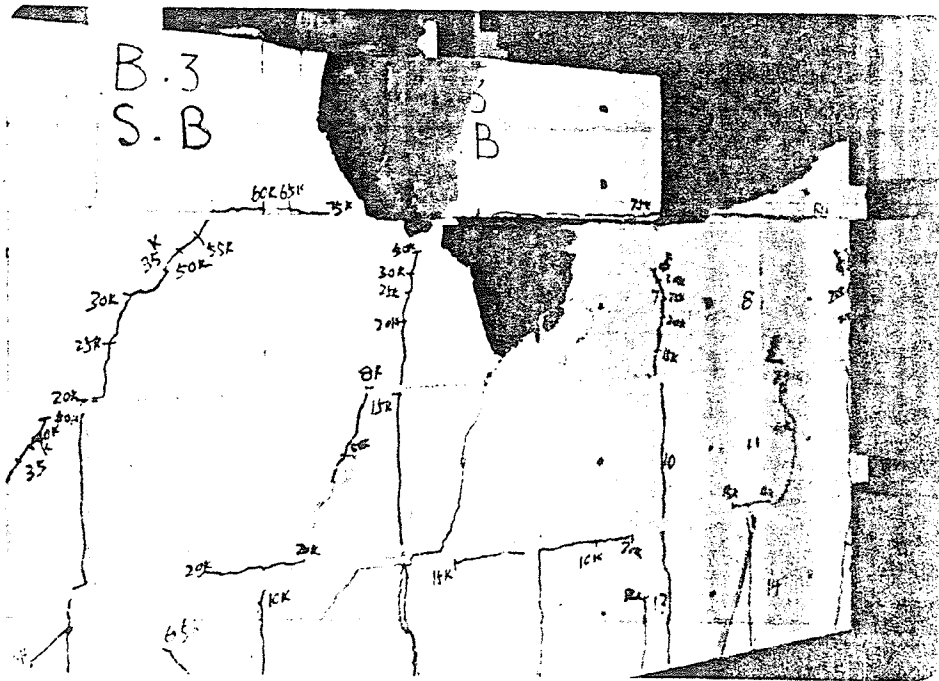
Cracking and flexural failure of Beam #3(Side B).
